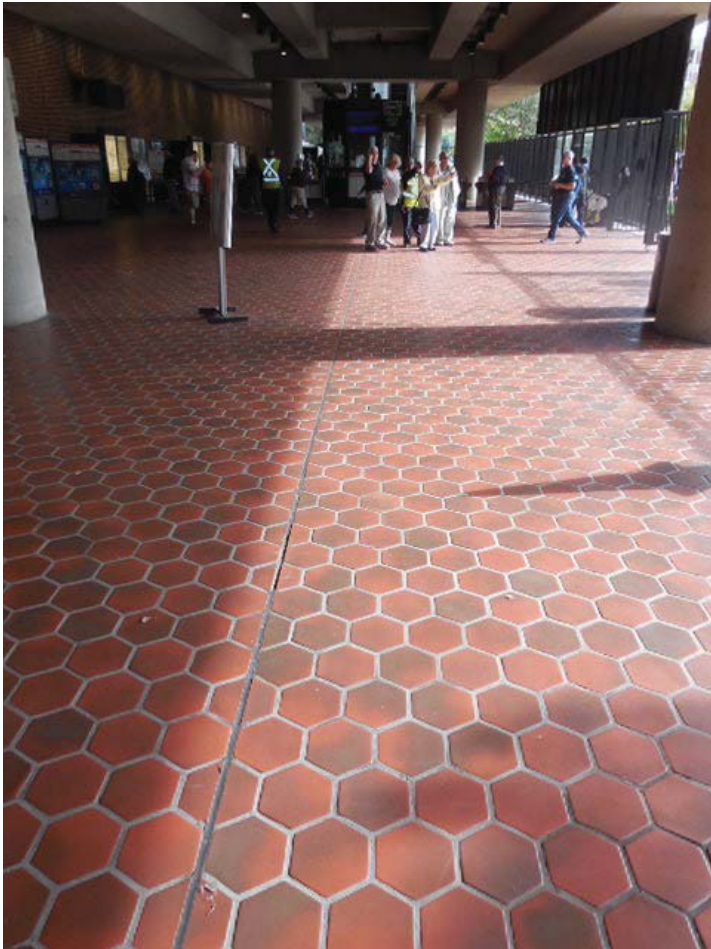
C13 King Street (South) – Handholes in mezzanine floor
